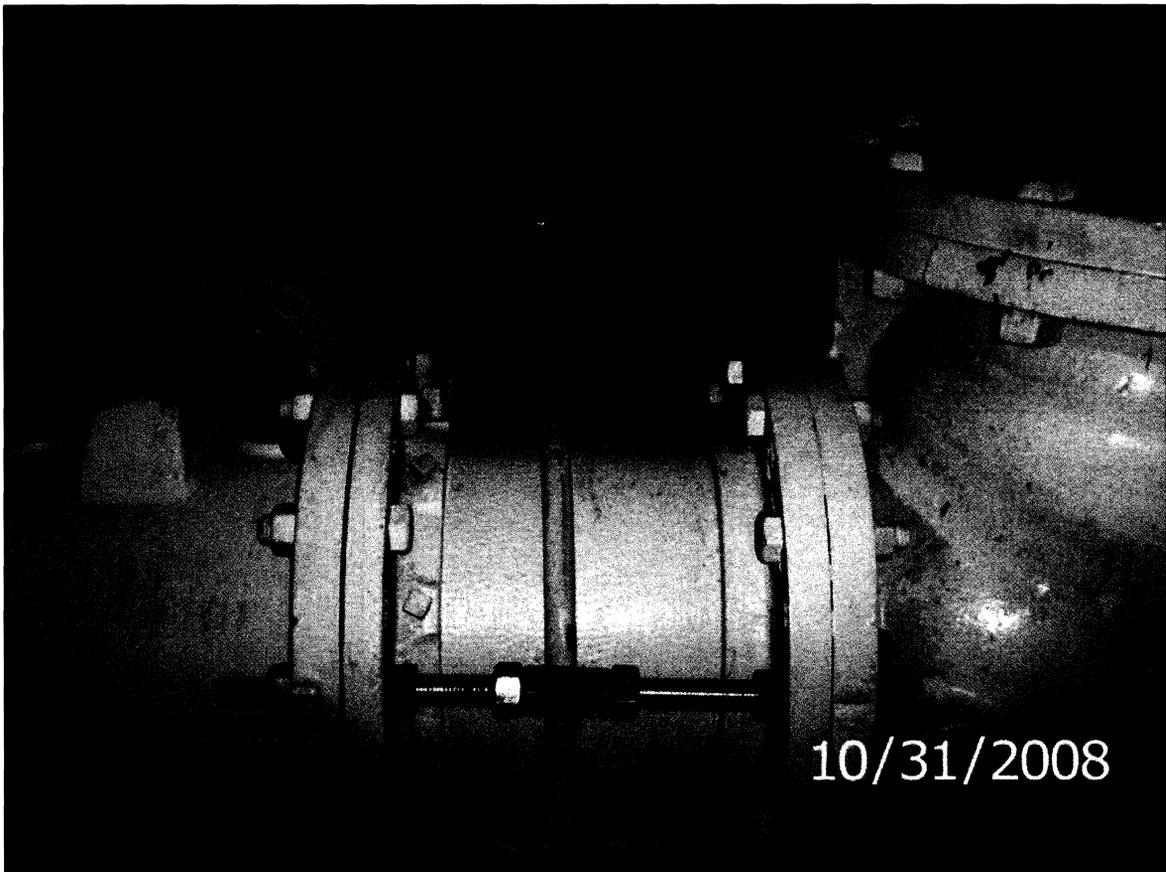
New Tie-Rods Installed Across each Uni-Flange Coupling
